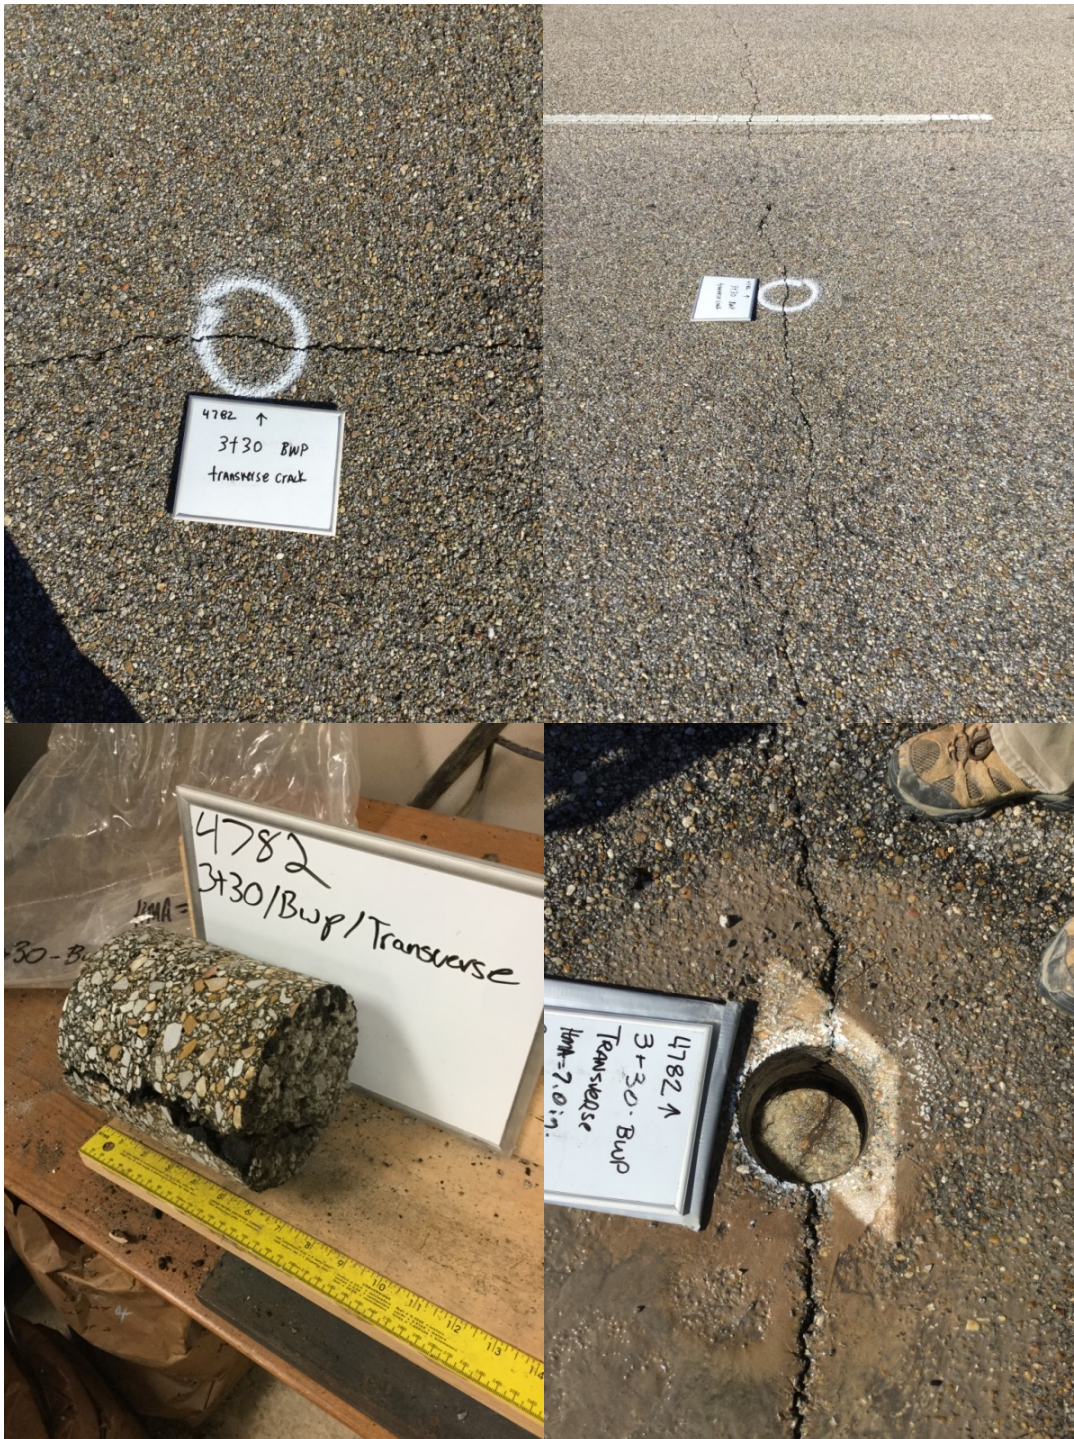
Photos of Pavement Surface and CSM Layer near Station 3+30 in Section 4782
